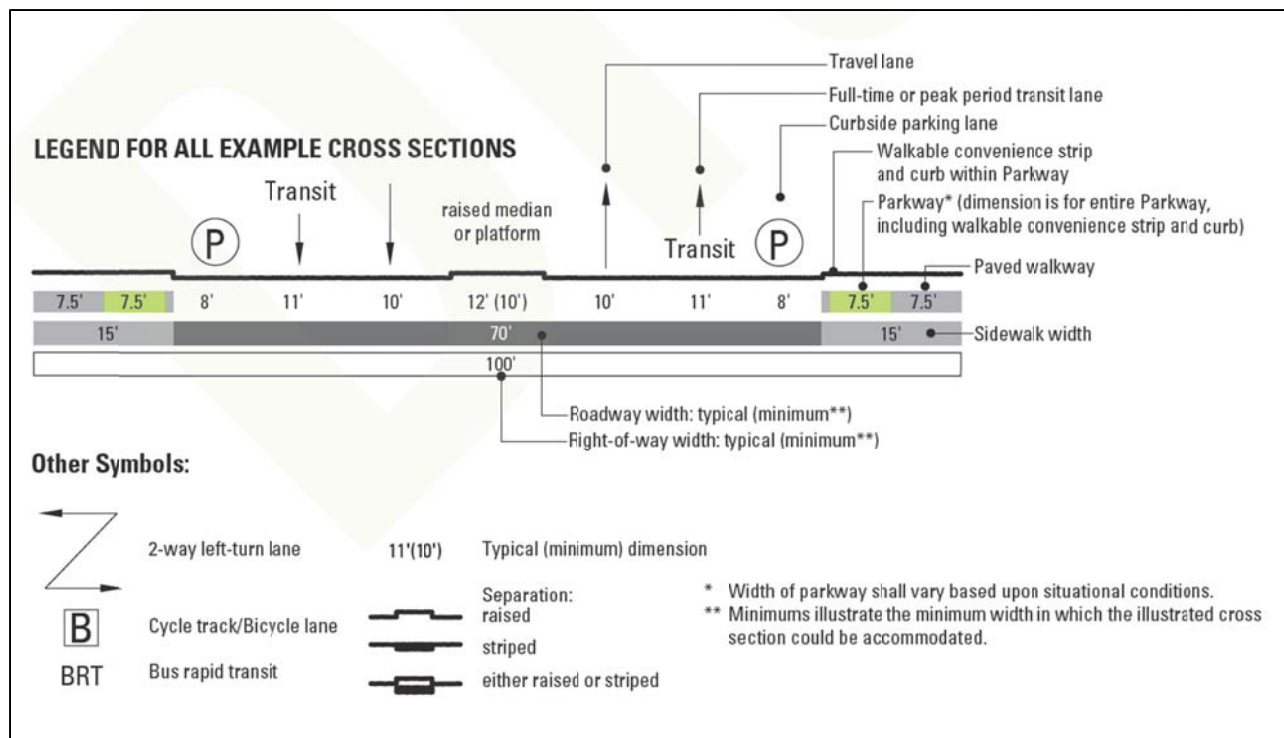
Typical Street Cross-Section from the City of Los Angeles Complete Streets Manual
